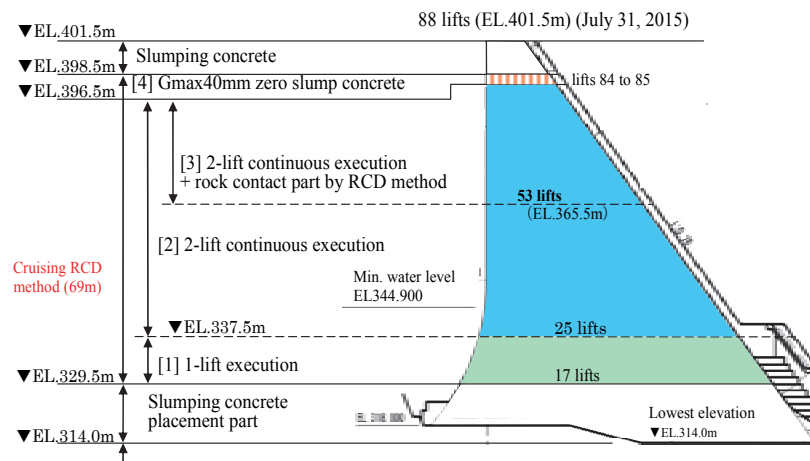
Placement sections by cruising RCD construction method (placement section [1] - [4]) at Gokayama Dam
